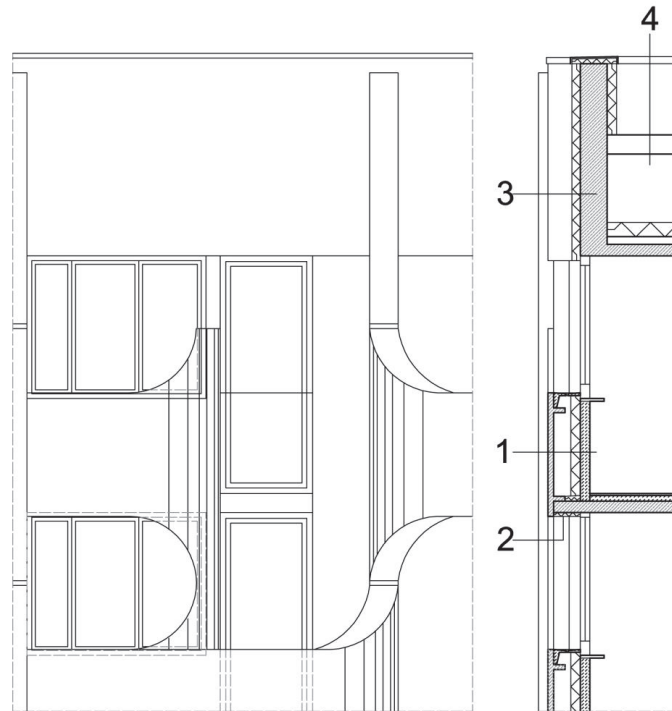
The façades of residential buildings at Grunwaldzki square—elevation and section. 1. The designed external wall (prefabricated): repaired and painted white prefabricates 6.0 cm, external void, mineral wool 8.0 cm, internal walls made of asbestos removed and replaced with light concrete blocks 12.0 cm, internal plaster 1.5 cm. 2. Insulation of loggias—mineral wool. 3. The designed external wall: silicone plaster 1.5 cm, mineral wool 8.0 cm, aerated concrete blocks or reinforced concrete wall 24.0 cm, internal plaster 1.5 cm (between windows). 4. The designed roof slab: 2x roofing felt, levelling layer 2.0 cm, slag concrete slabs in decline 8.0 cm, ventilation gap 5.0–30.0 cm, blown-in mineral wool granules in the air cavity 20.0 cm, prefabricated channel slabs 24.0 cm, internal plaster 1.5 cm (drawn by the Authors).
